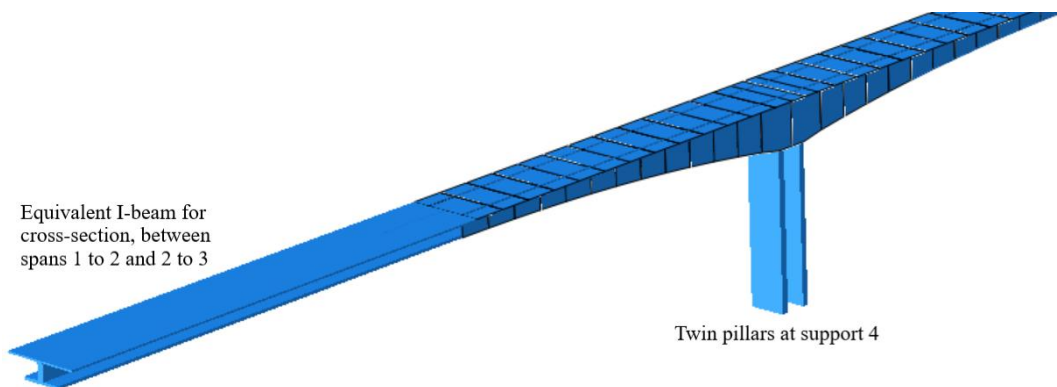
Beam profiles for span and support at the northwest end of the Alvik bridge.
